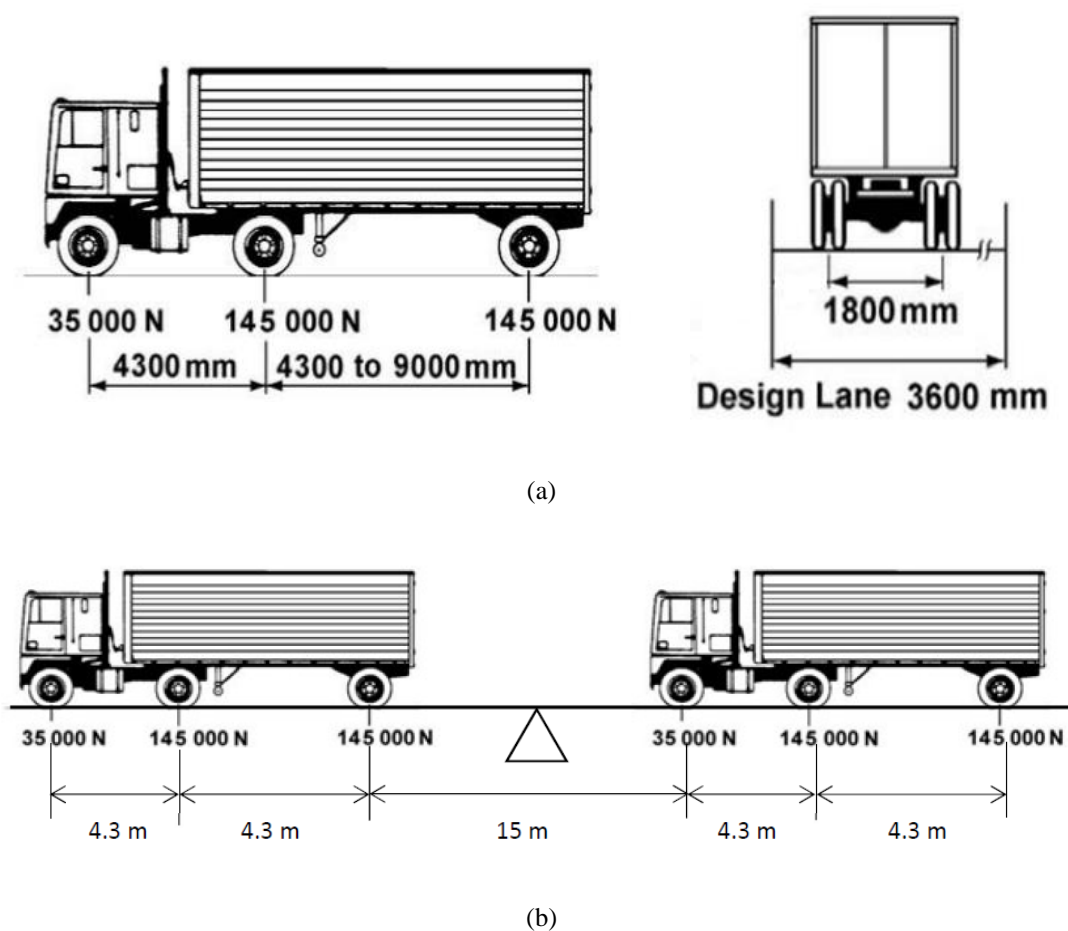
(a) HL-93 Design Truck, (b) Two trailing HL-93 trucks, loaded on bridge piers to produce extreme reactions
